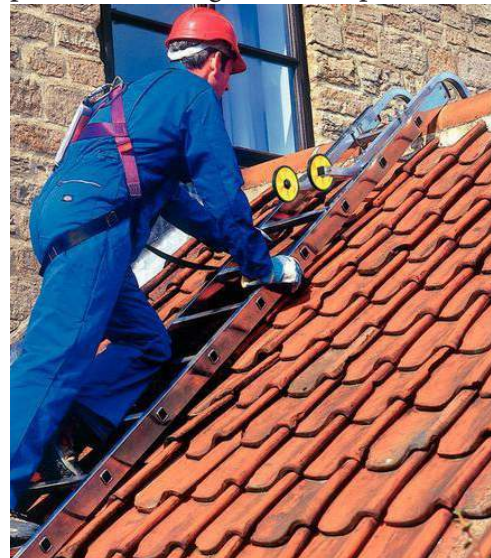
Ladder with ridge hooks on a terracotta roof
